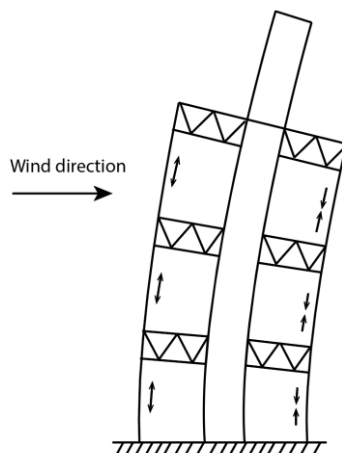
Outrigger system, with steel truss belt as outrigger
